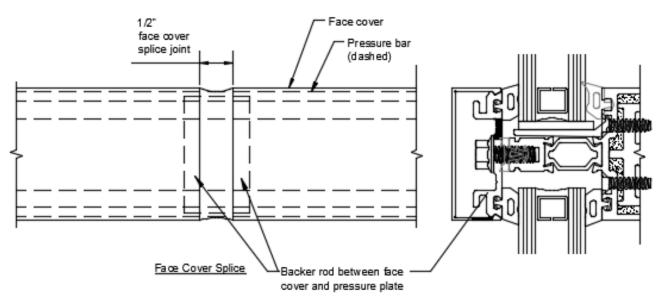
Pressure Plate/Face Cap Splicing & Sealing @ SSG Mullions (Intermediate Horizontal Shown; Head & Sill Similar)
